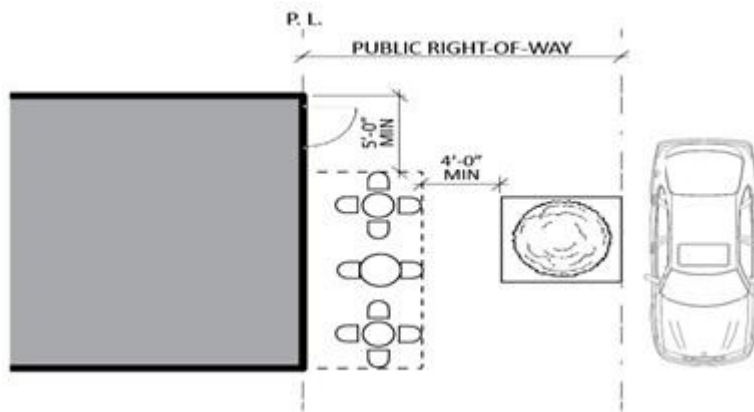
Example of an outdoor dining area in the public right-of-way abutting a storefront wall without a barrier.
